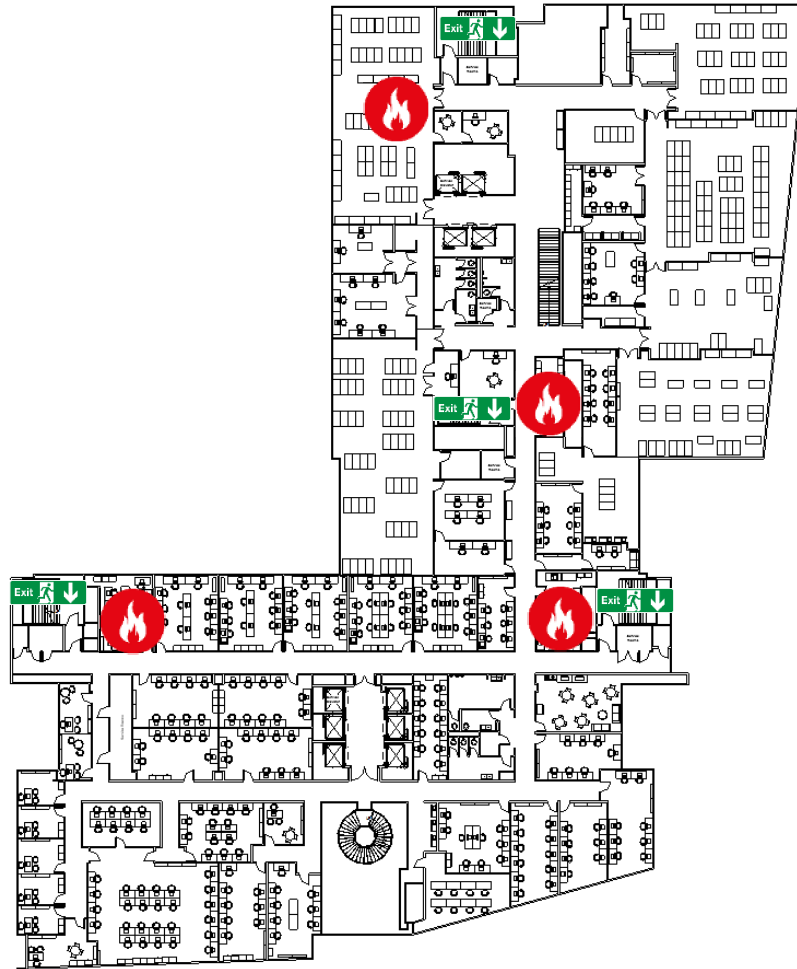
9th Floor Plan of EV Building With Fire Locations
